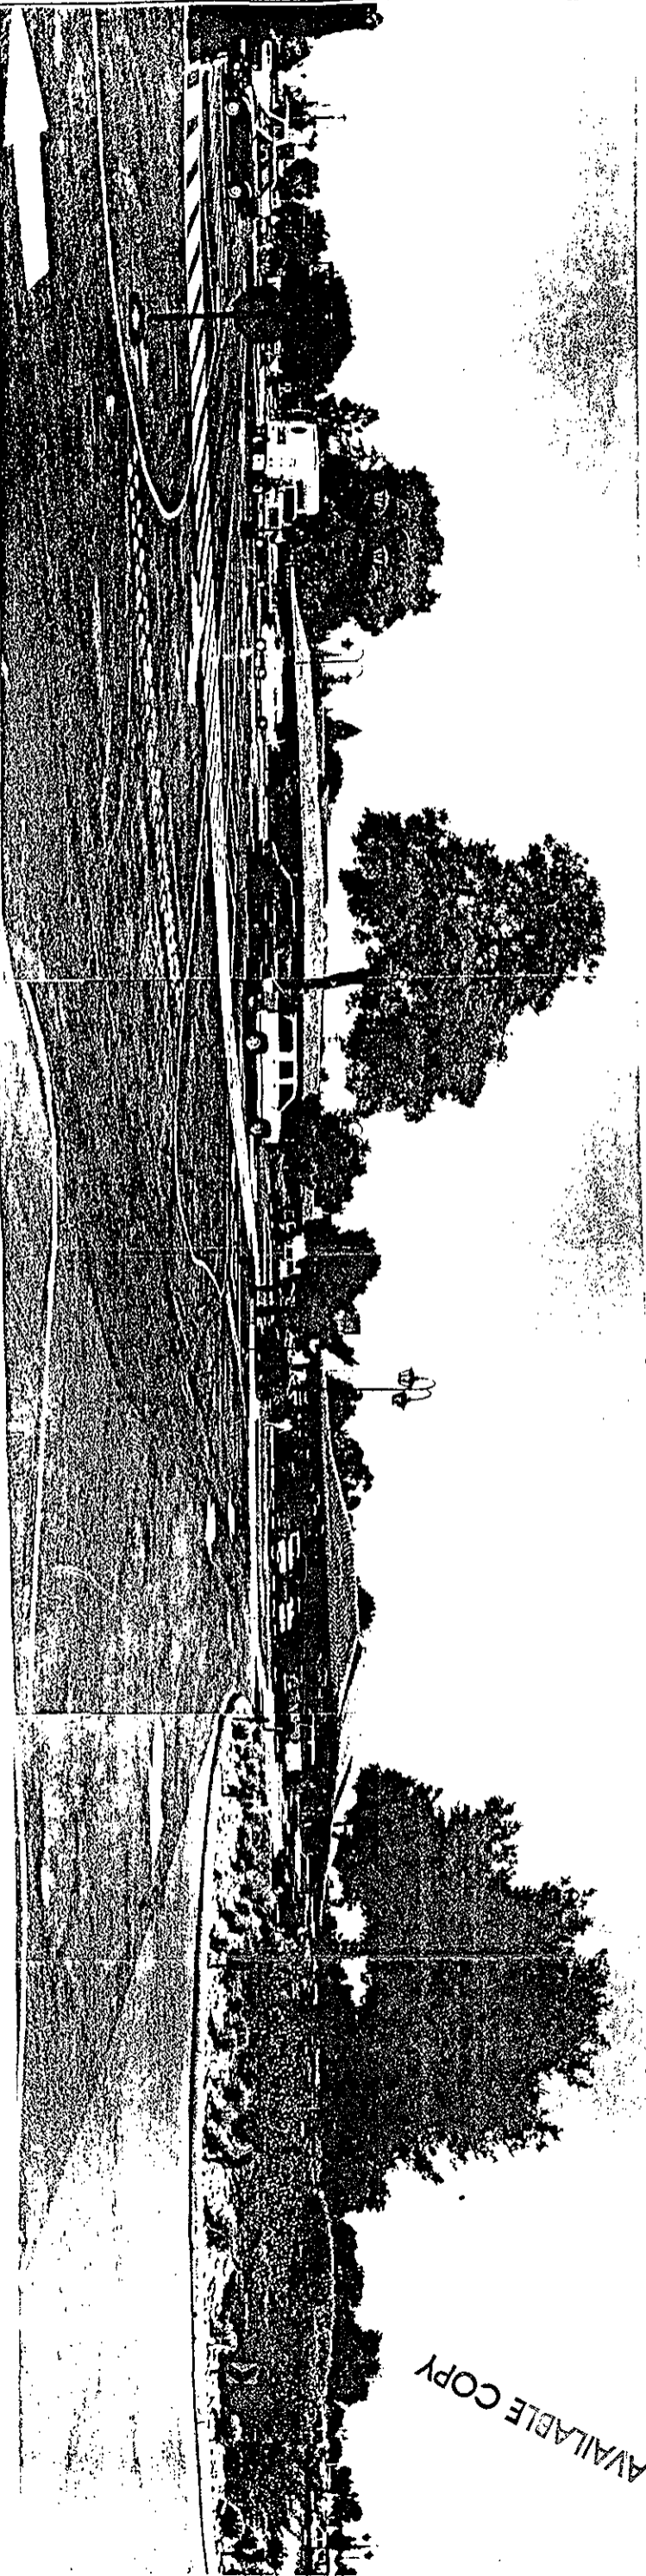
Interior view of the project site taken from the southern boundary, looking towards the northwest.
